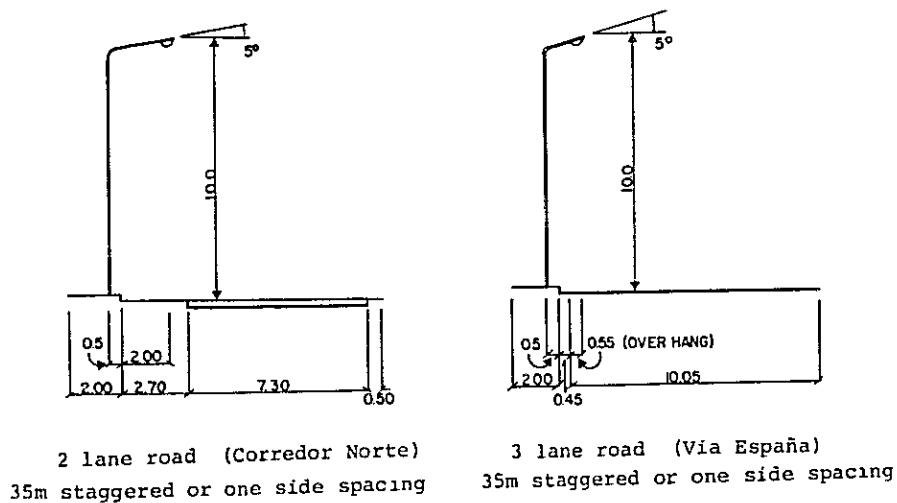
TYPICAL LIGHTING INSTALLATION
